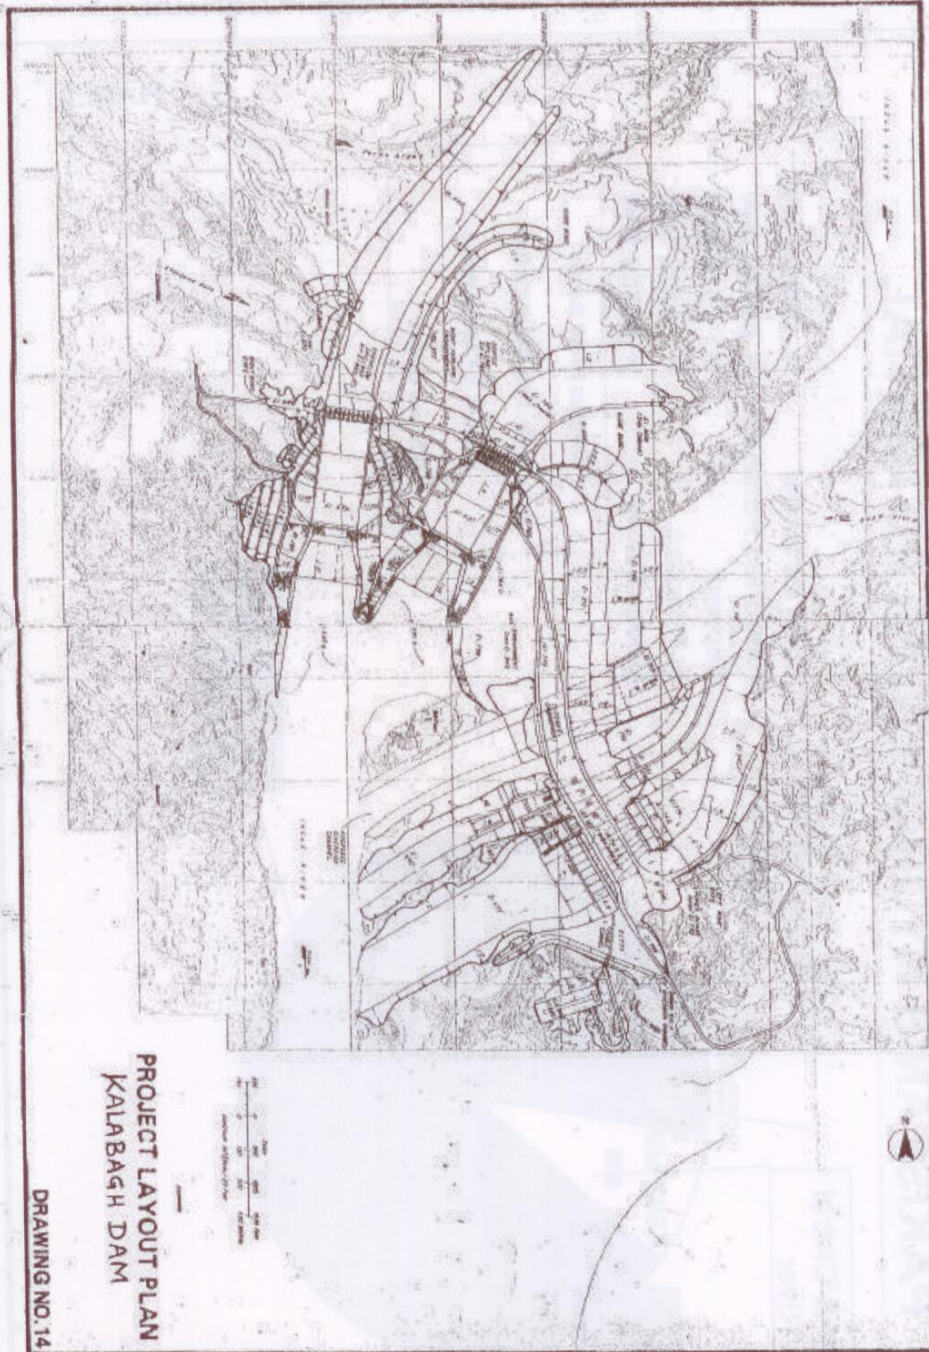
PLATE-III: KALABAGH DAM PROJECT – LAYOUT PLAN
